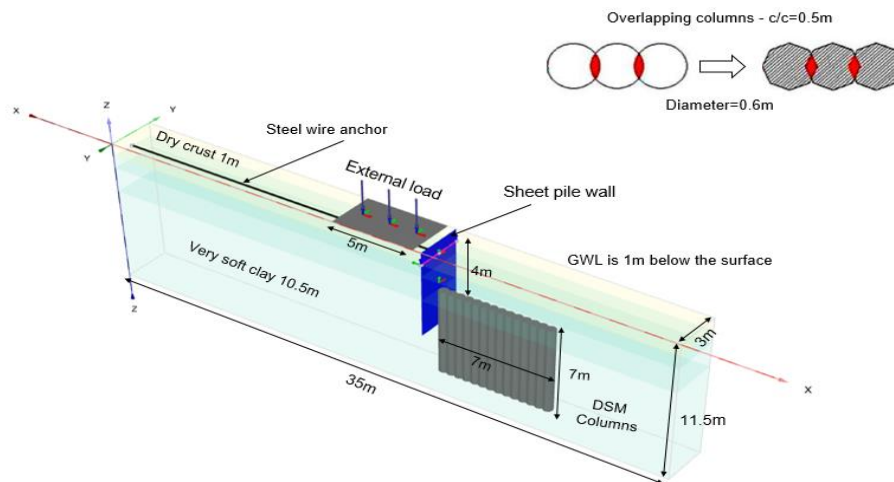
3D model of excavation supported by intersected columns with 1.5m spacing of rows of columns is (modified after Ignat et al. 2015)
